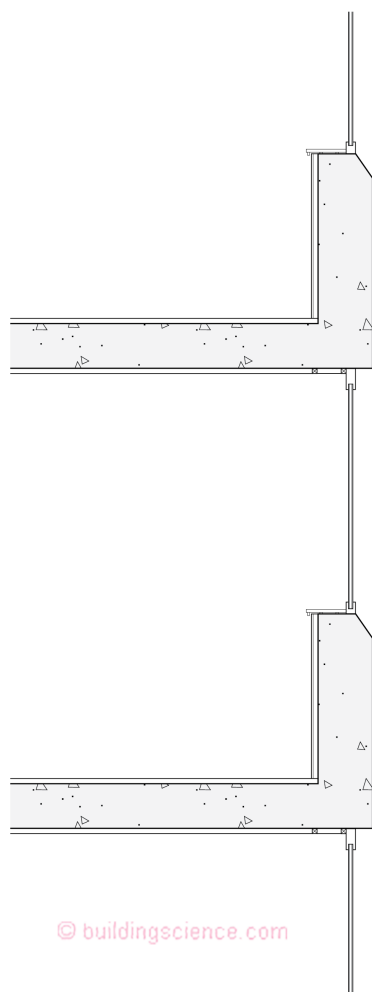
Grenfell Tower – Pre-Retrofit Assembly – Window aligned with concrete structure.
